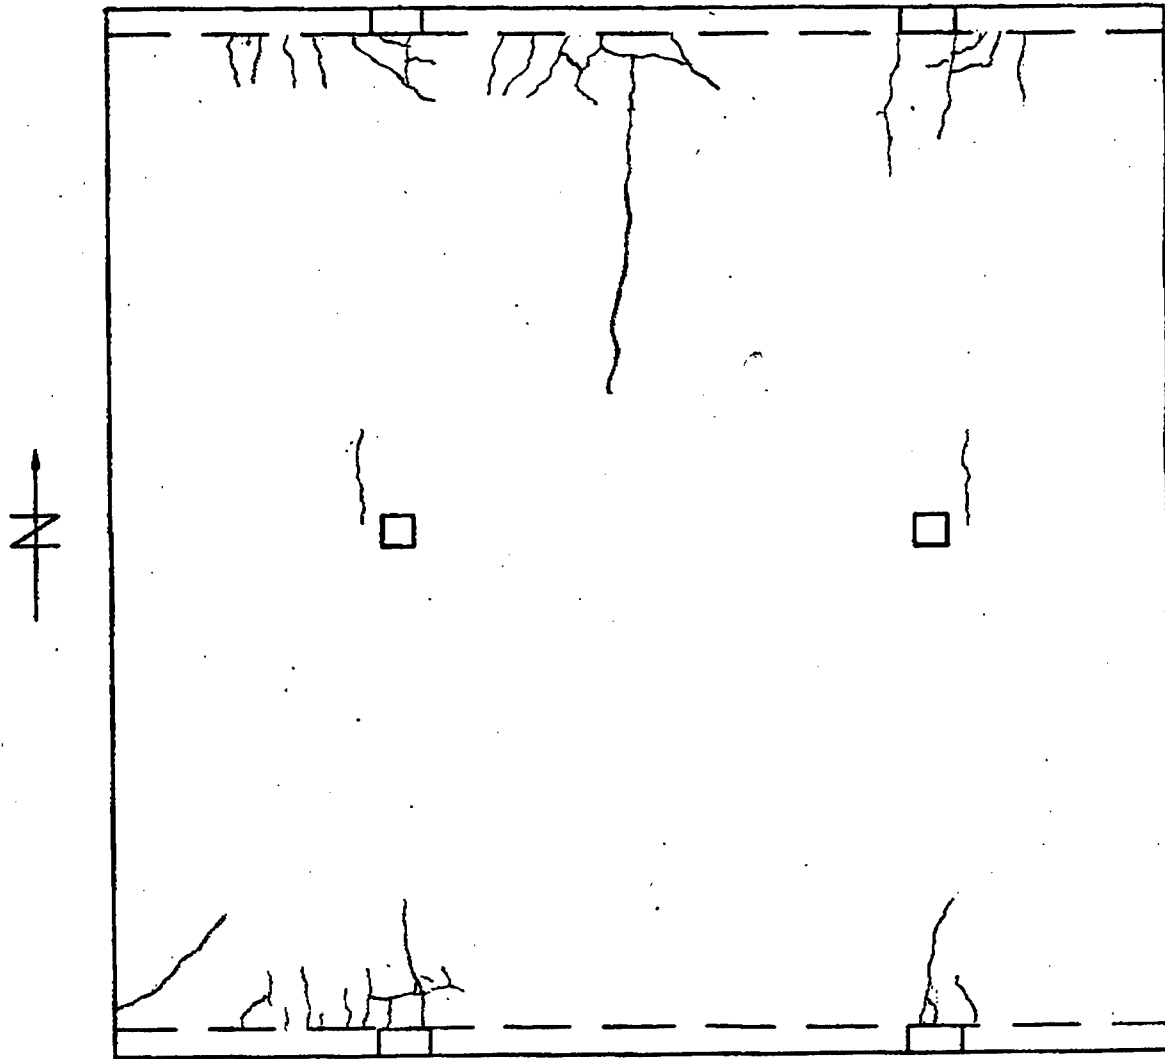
Crack Pattern, Third Floor Slab, Top Side, Pre-Test
